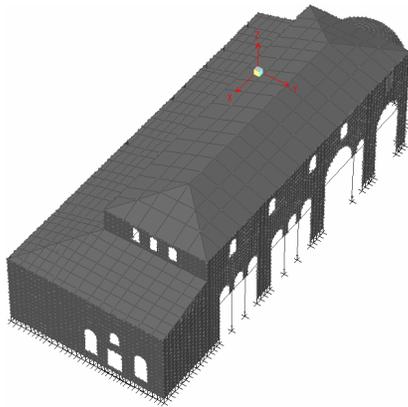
The Basilica structural system with the interior colonnade of the central nave
